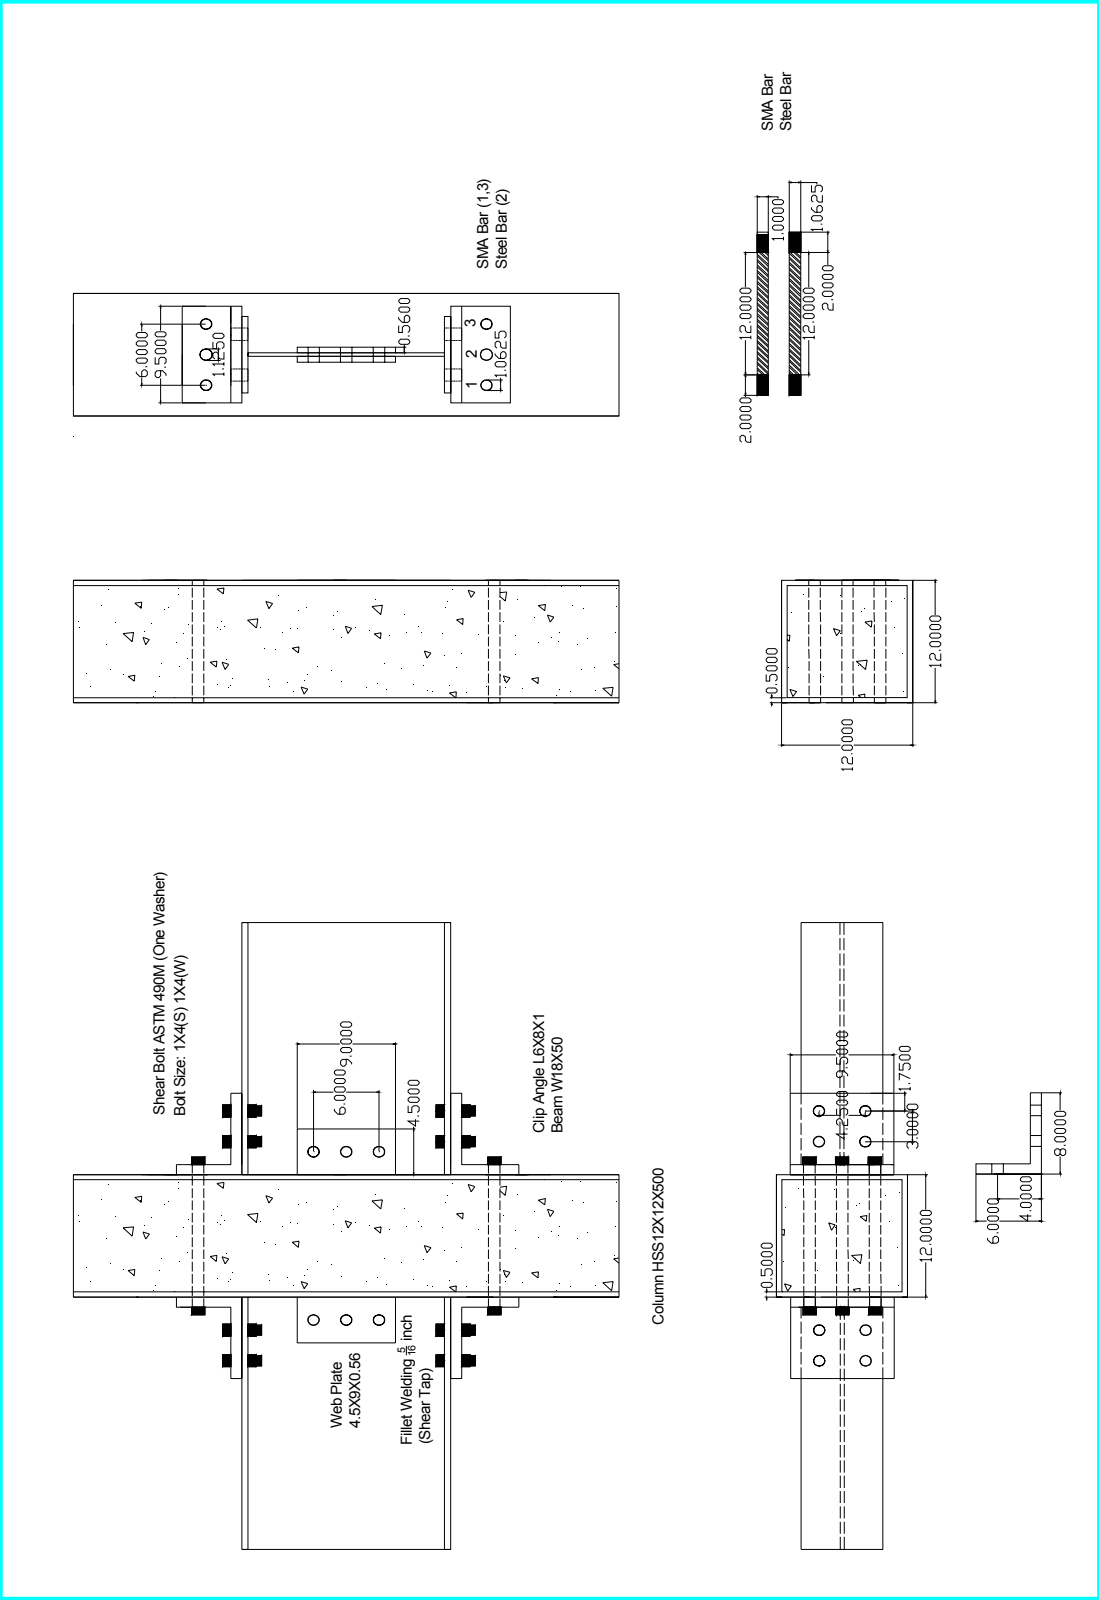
Schematic drawing of RCFT clip angle connection details
